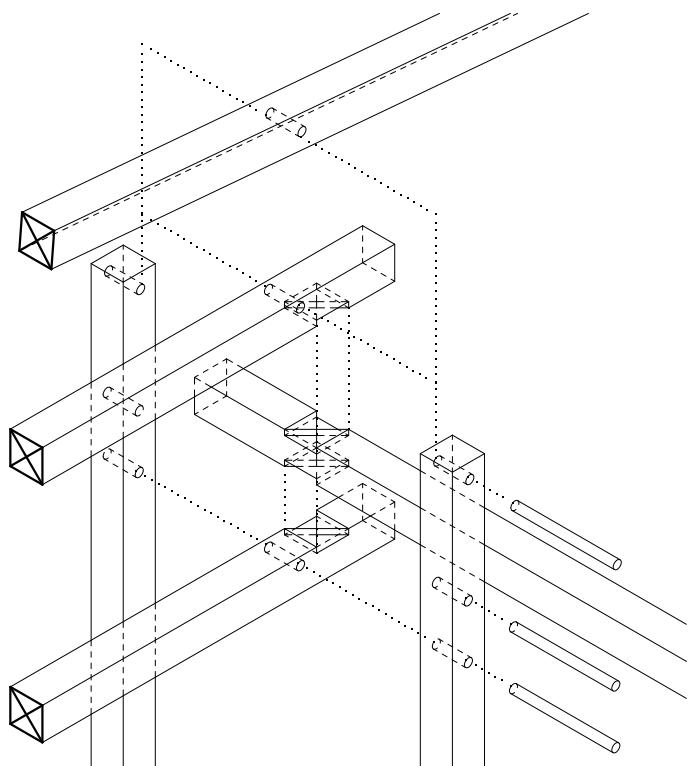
Wooden roof joint detail I:20. by Author (2023). [image]
